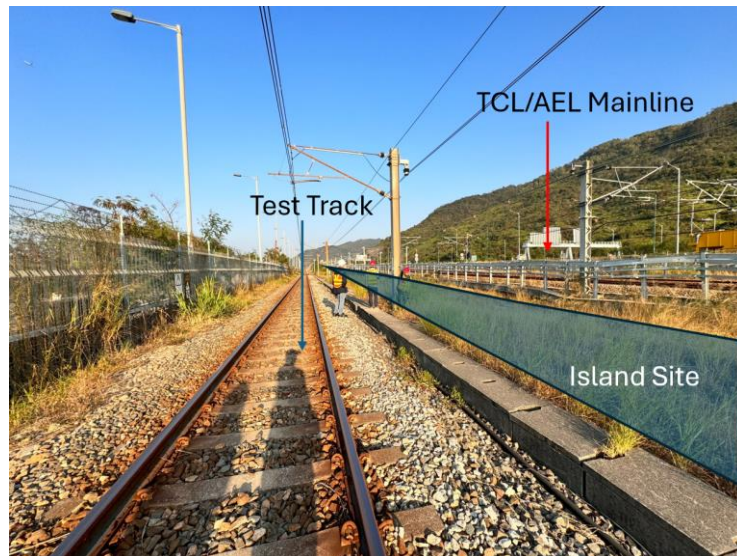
Site Photo showing the Work area W2 at Test Track and TCL/AEL Mainline
